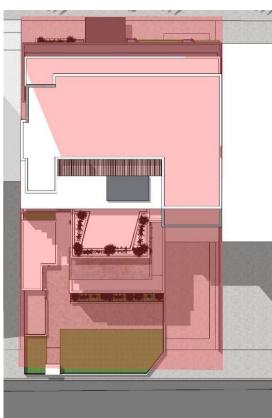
View to roof of proposed development (un-highlighted portion indicates non-compliant portion of building)
